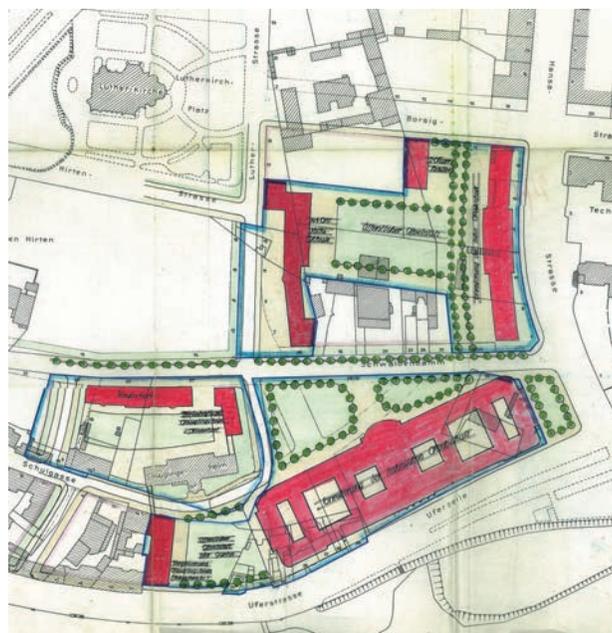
Plan of land development to the west of Norwida Street; designed by: Max Berg, 14.10.1913 [2, p. 270 (fragment)]
